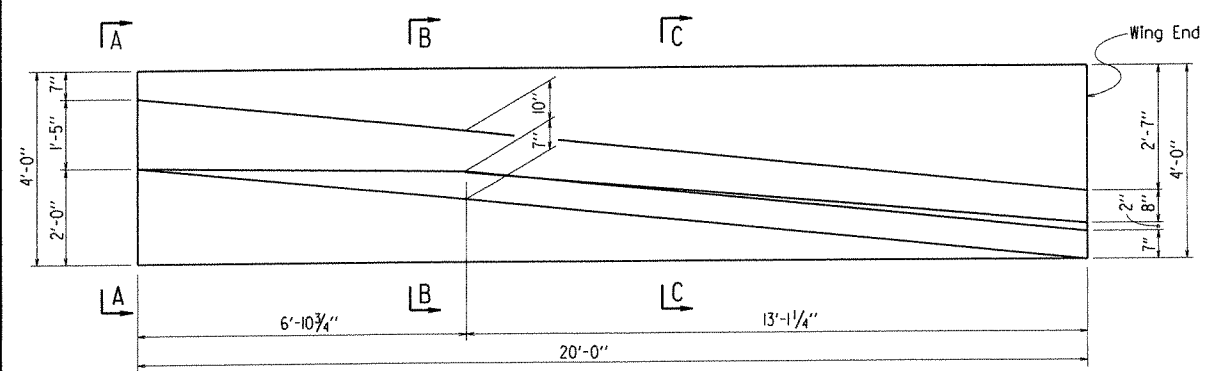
DETAILS OF TYPE H METAL BRIDGE RAILING WEST FORK OF WHITE RIVER
